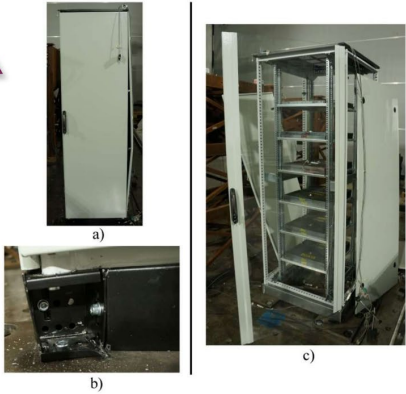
Damage observed to the electrical cabinet specimens during the shake table tests: a) Permanent bending of one of the lateral walls of Specimen 1; b) Failure of the attachment structure of Specimen 1; c) Collapse of the lateral walls of Specimen 2.
